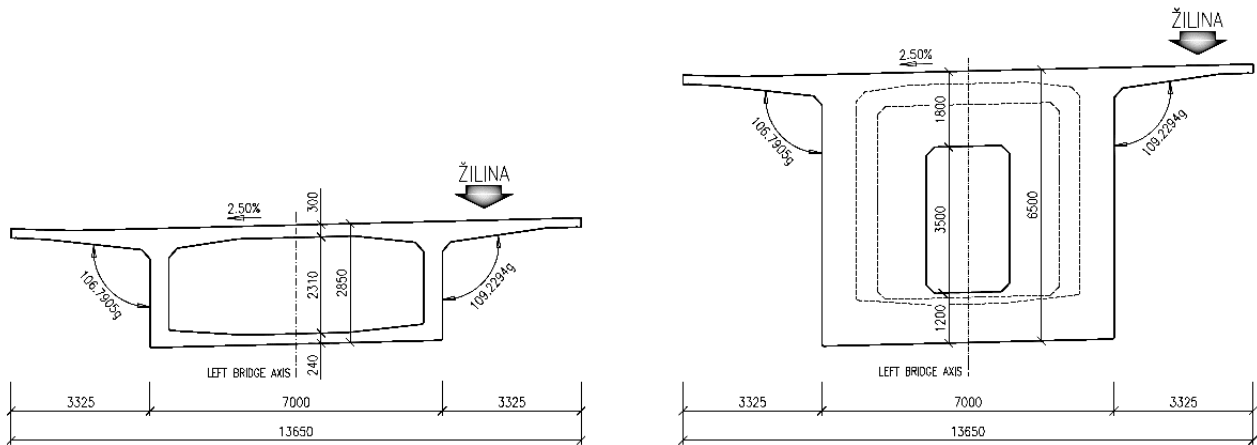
Cross sections of single cell prestressed box girder at mid-span (left) and pier (right).
